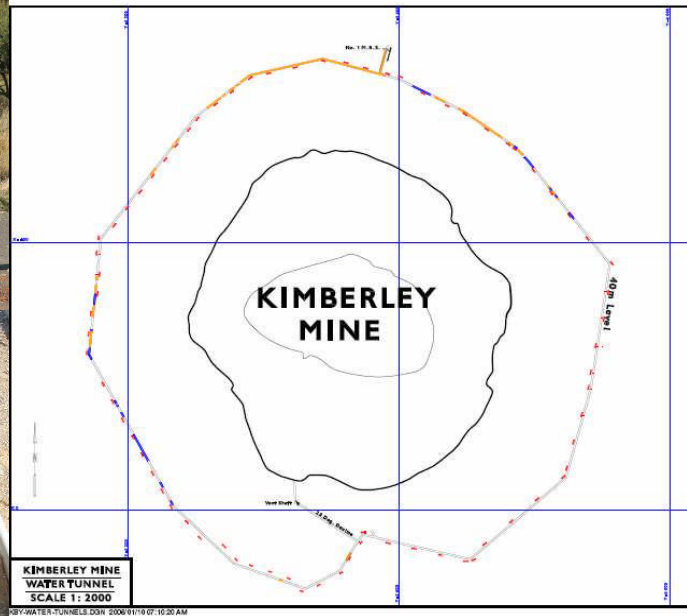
Kimberley "Big Hole" Water Tunnel Layout (Maree, 2017, p. 42)
